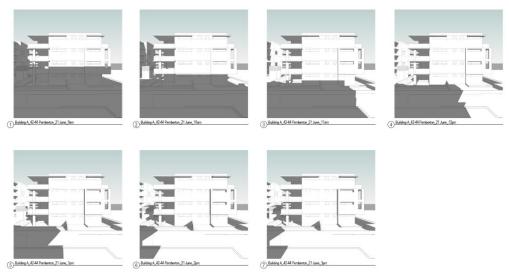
Elevational shadow of Building A at 42-44 Pemberton Street Botany
